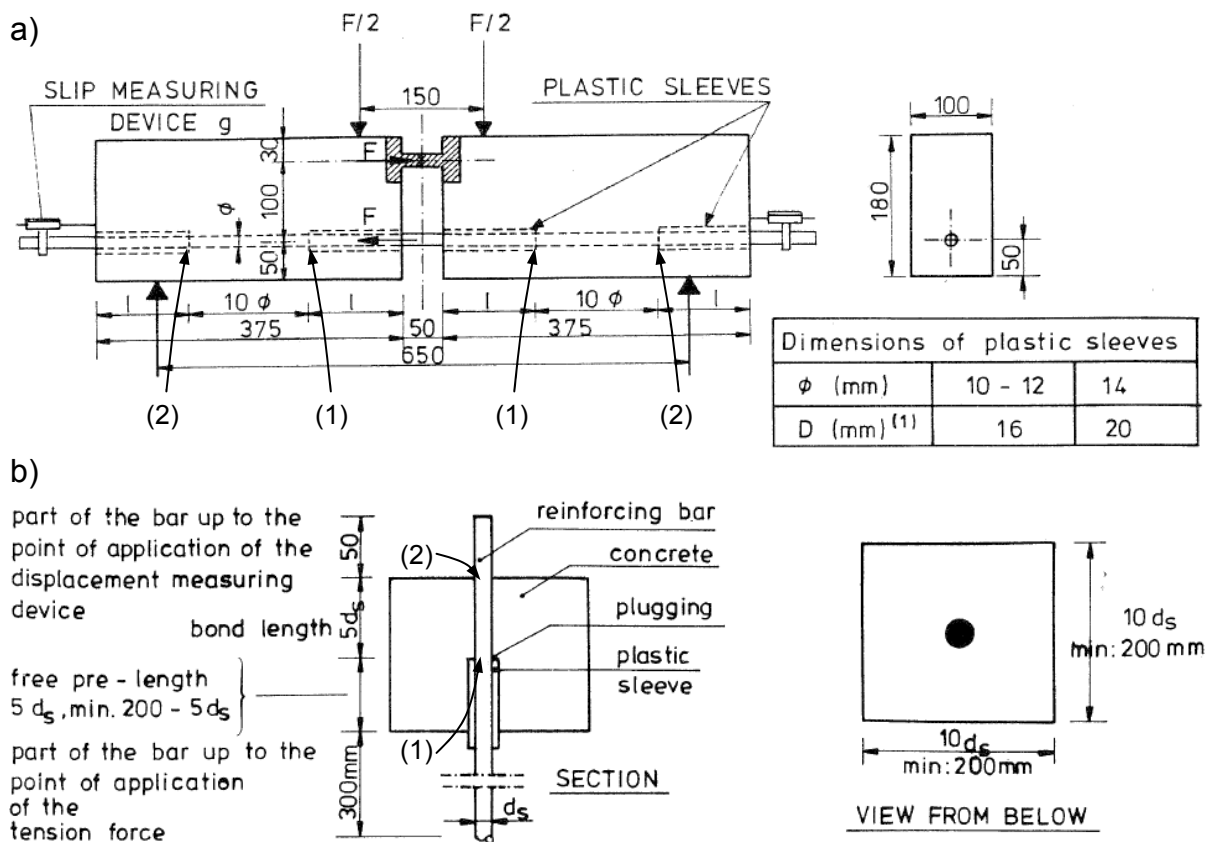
Defined test setup according to RILEM/CEB/FIP (1982): a) Beam test RC5; b) Pullout test RC6; (1) loaded end and (2) unloaded end
